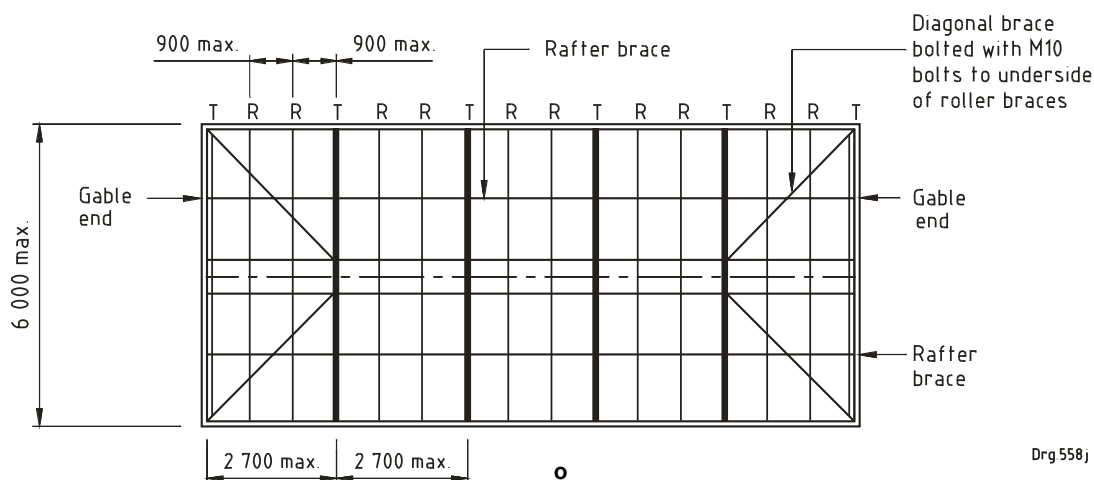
Elevation of truss for thatch roofing in gable-to-gable rectangular buildings that have a clear span that does not exceed 6,0 m
